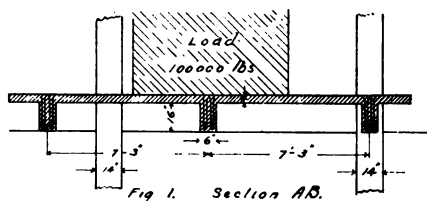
Diagram of Girder 24 feet, 6 inches span, loaded with 100,000 pounds, Salvation Army Building, Cleveland.
